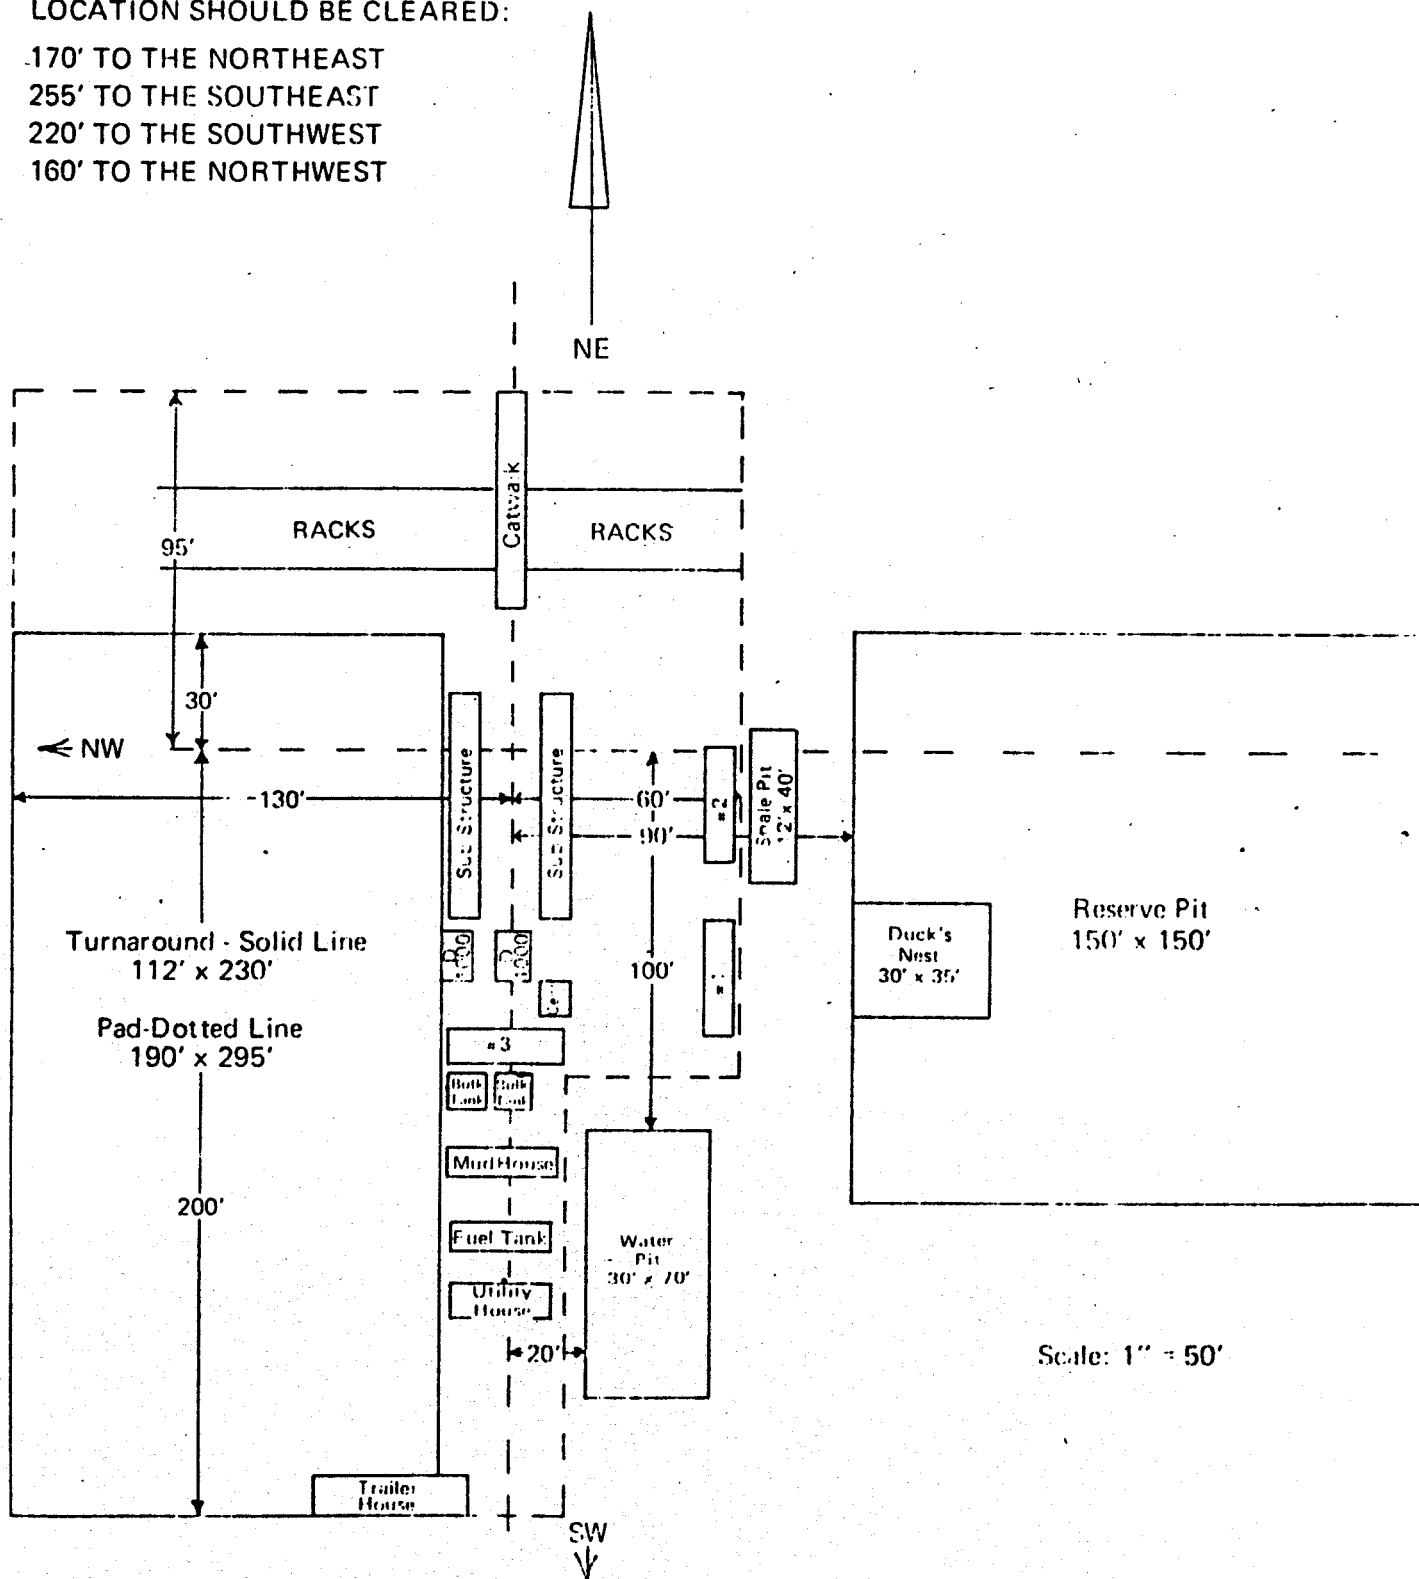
Typical drilling site arrangement (1) (General Crude Oil Co., 1977)
